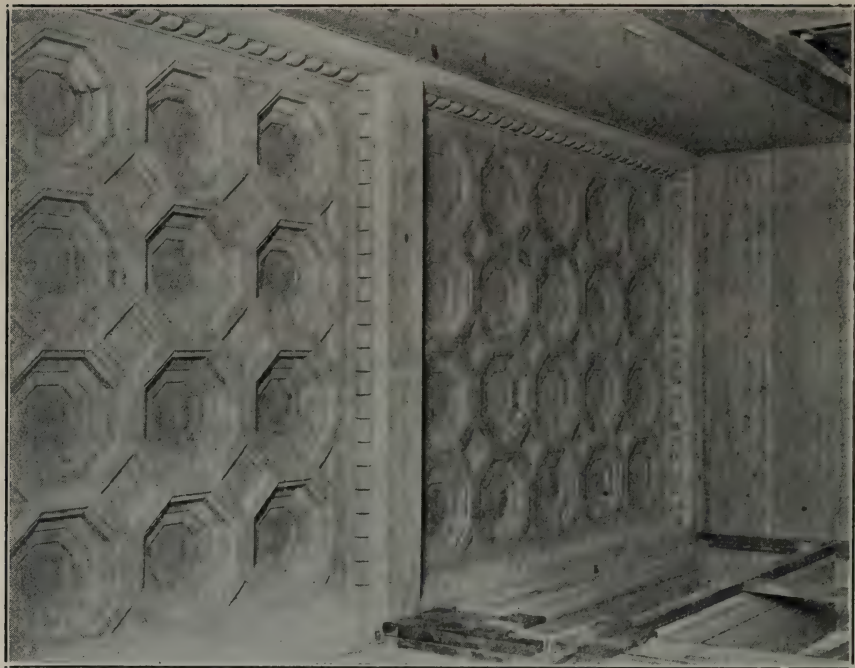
Two designs of poured-in-place ceilings. Photos by Whittington, Los Angeles.
